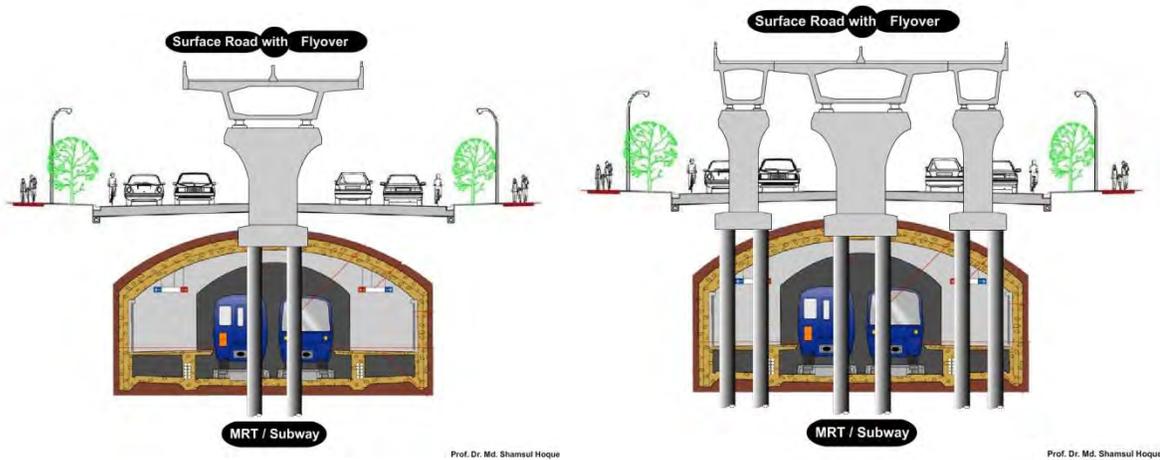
Elevated Highways and Flyover Piles and Foundation Conflict With Respect to MRT6
